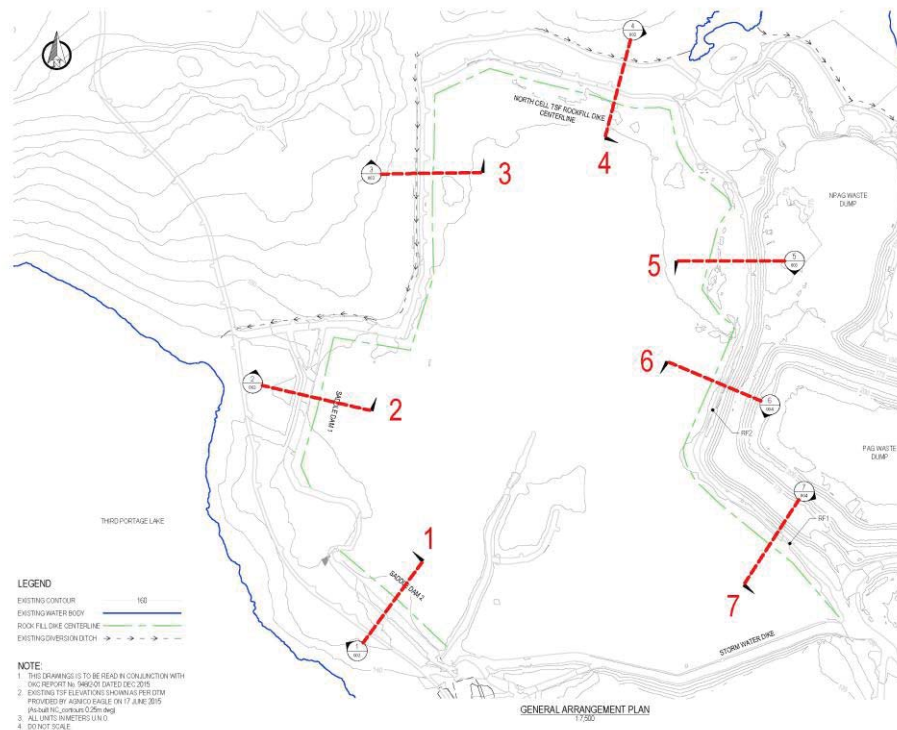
Plan view of Meadowbank North Cell TSF with slope stability and seepage analysis cross section locations.
